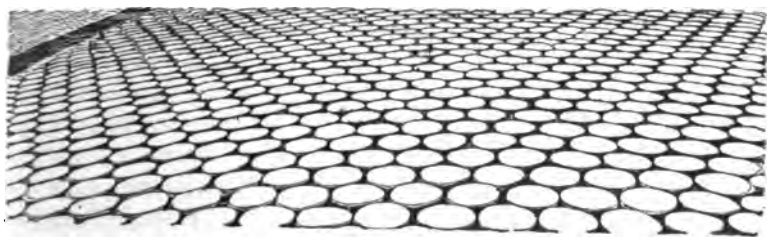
A. PAVEMENT OF ROUND BLOCKS.
